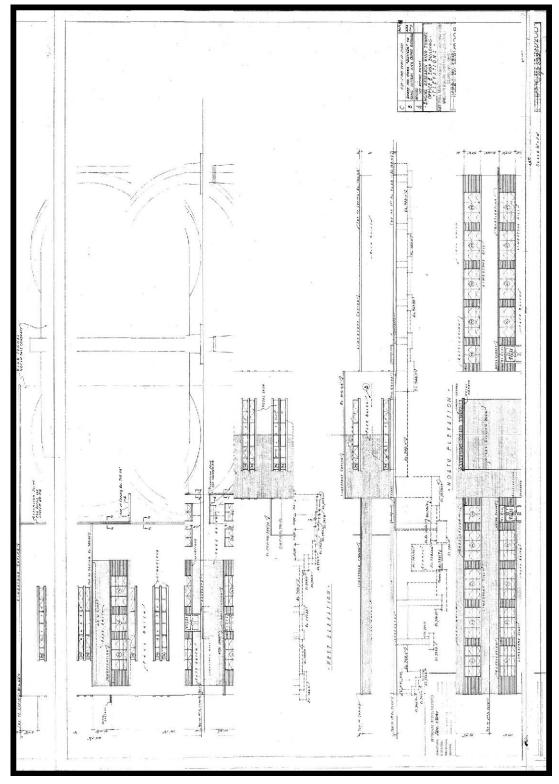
Elevation drawing of Shop and Office Building, 1942 (OH_Cuyahoga_AWT-Support_014).
